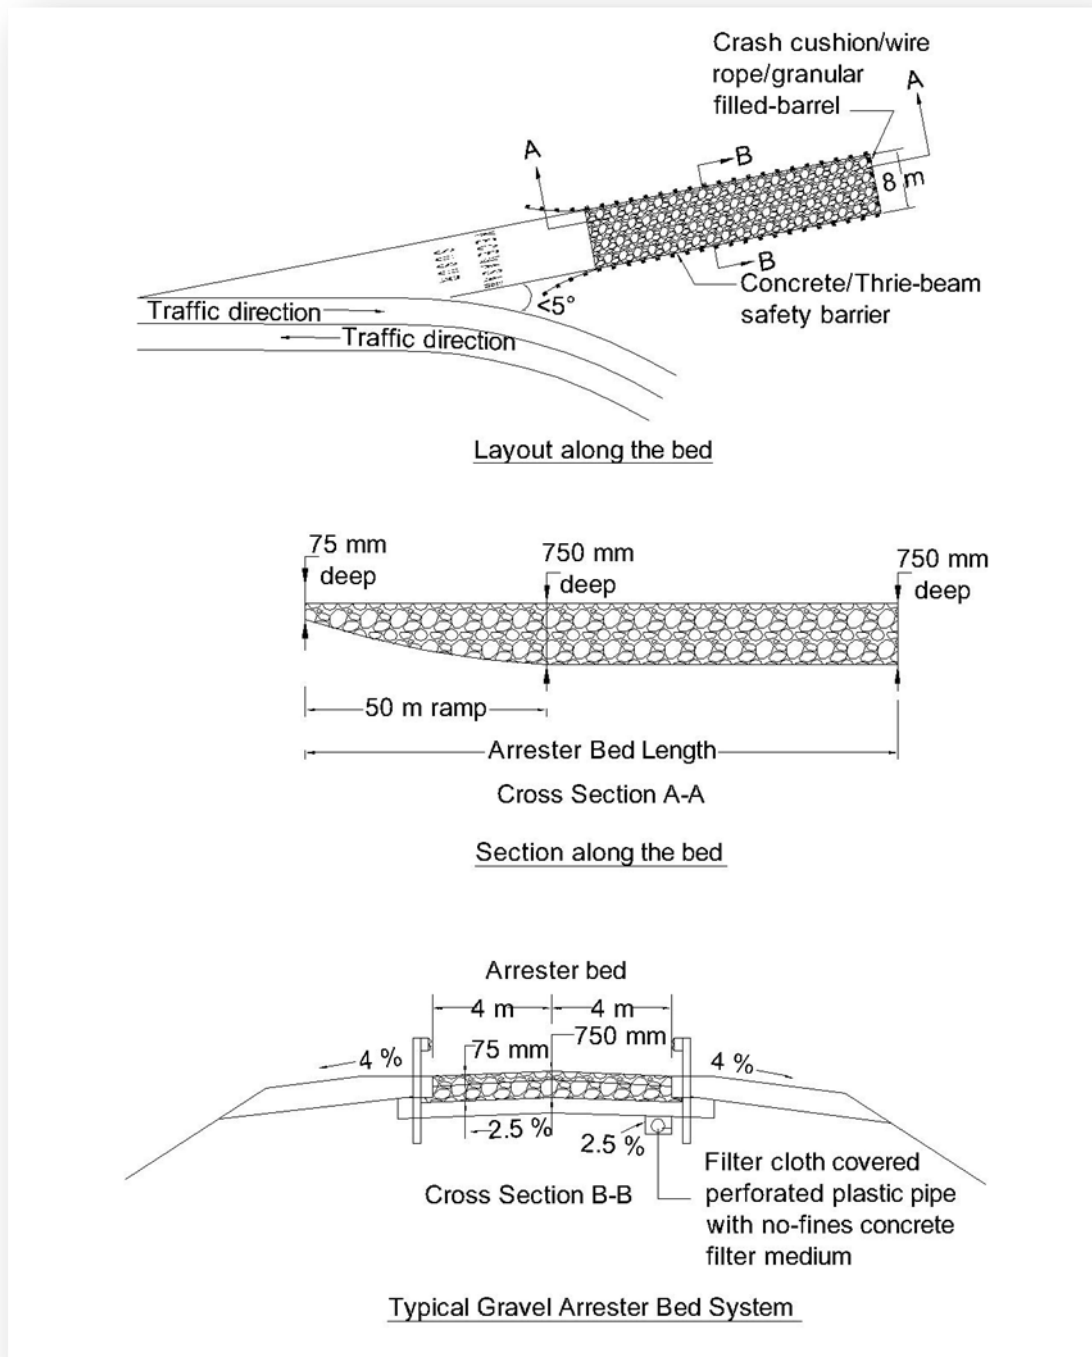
Typical Layout and Cross-Section of Escape Ramp
